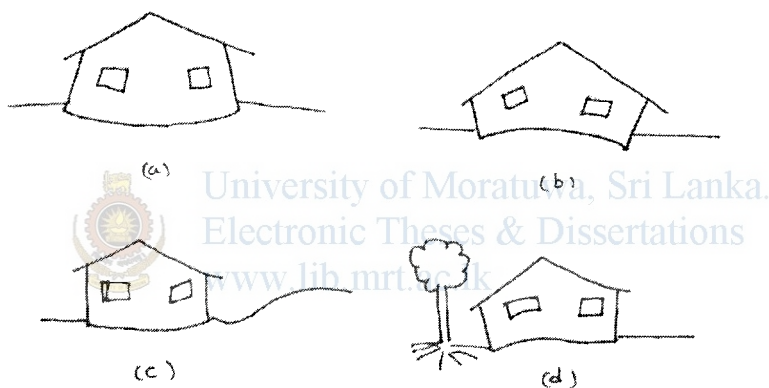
Typical distress patterns resulting from heave of expansive soils as indicated in foundations on expansive soils (a) adage lift, (b) centre lift, (c) Localized heave due to drainage problems, (d) Localized shrinkage caused by aggressive tree. (After Jones and Holtz, 1973)
